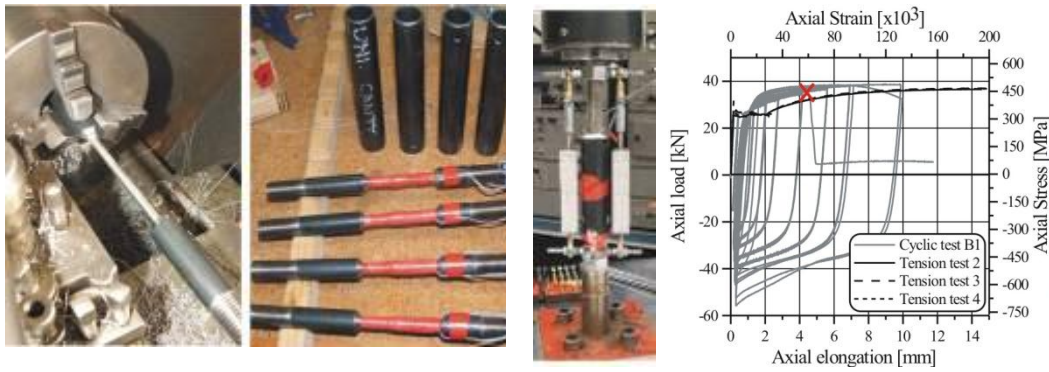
Manufacturing process and testing of the “Plug & Play” dissipaters (Marriott et al., 2008).
